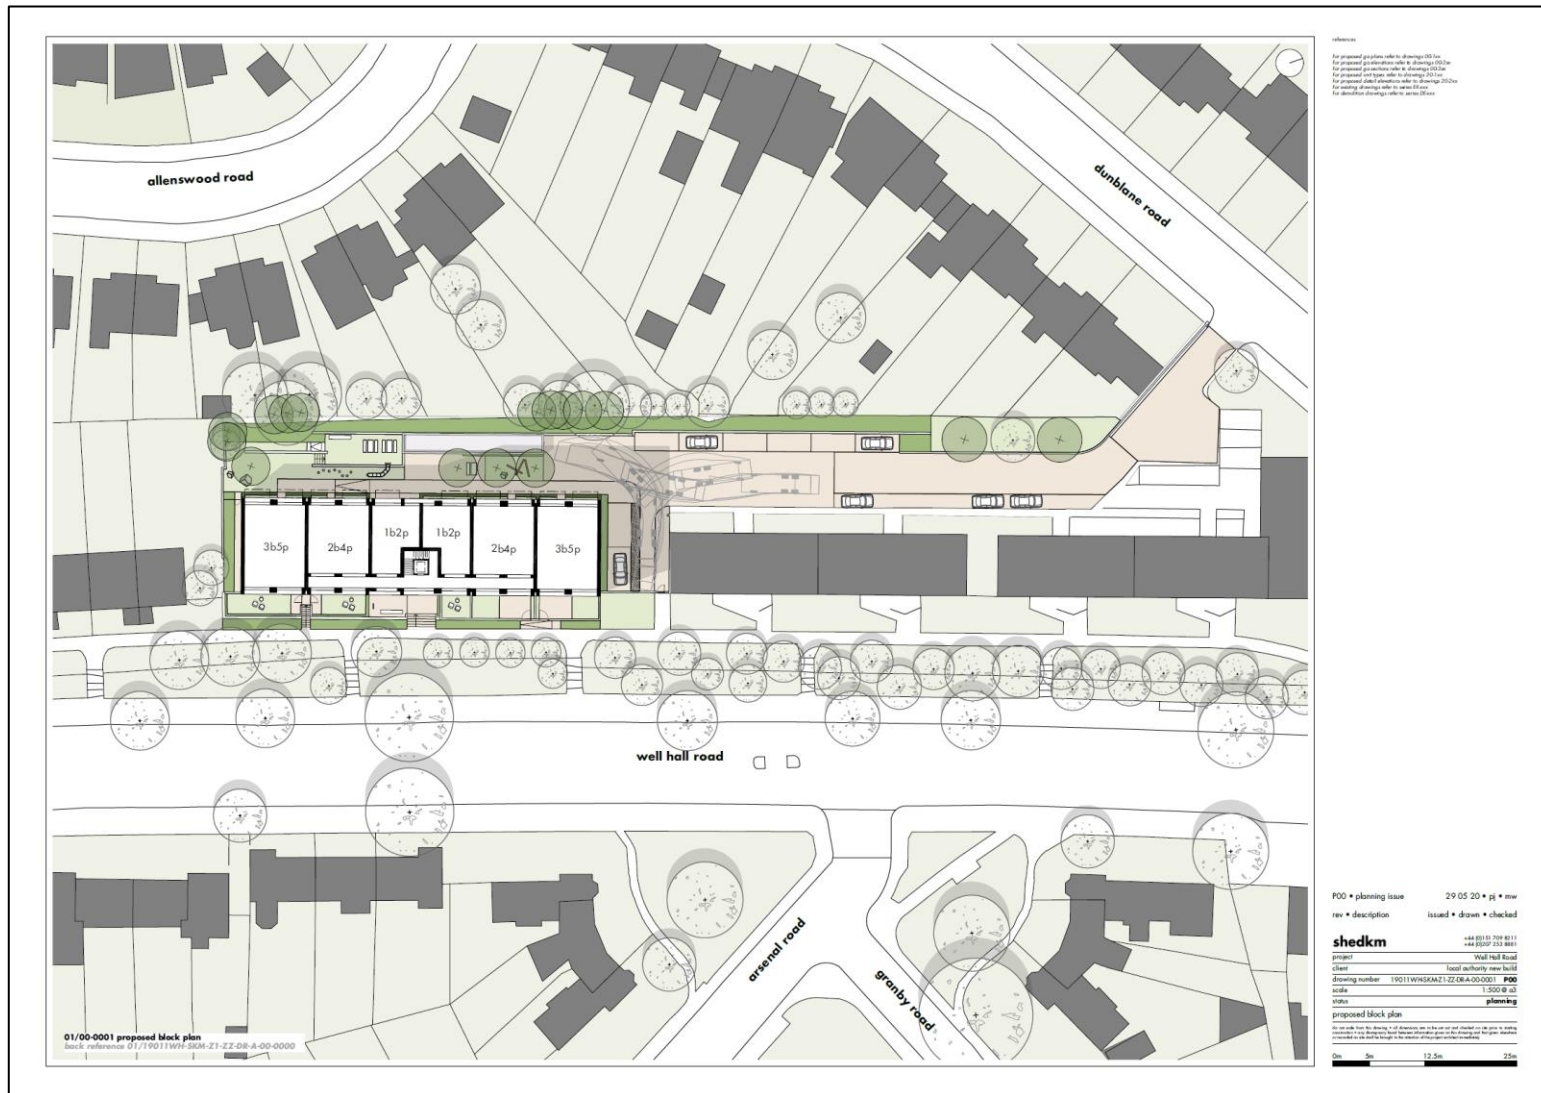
Proposed site plan (Reproduced by courtesy of Shedkm Architects)
